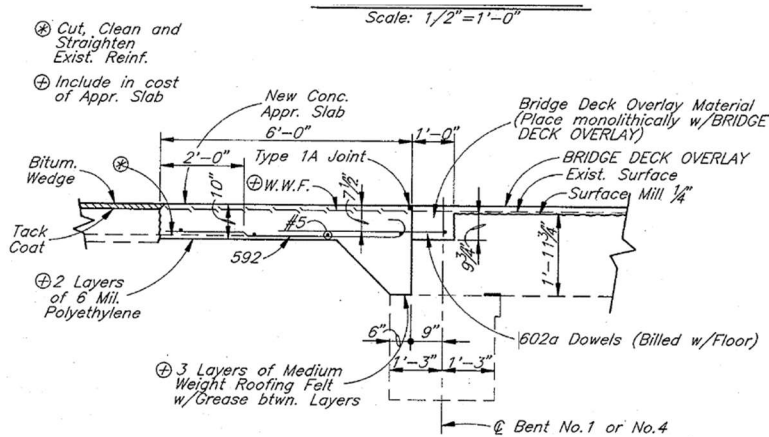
Abutment Detail of Bridge at Original Bridge Deck (NBI 14650) (1991)
